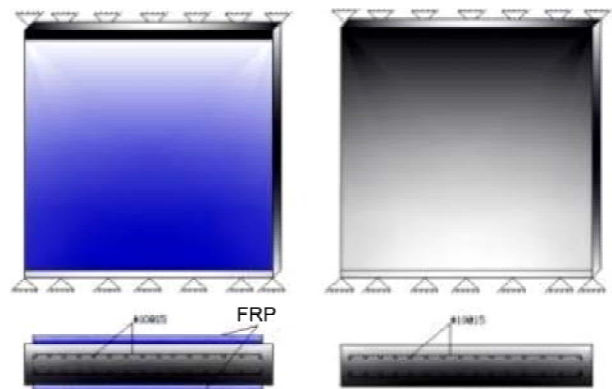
Details of reinforced concrete wall sections and how the fibers (CFRP) are arranged (Fazelipour & Tavakolizadeh, 2011).
